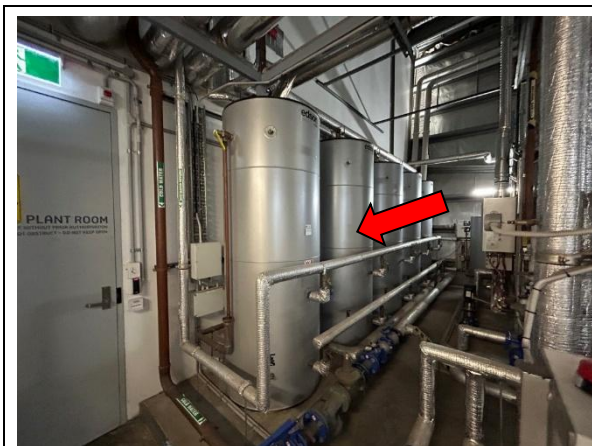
Level 15, Plant Room- SMF internal insulation to hot water units
